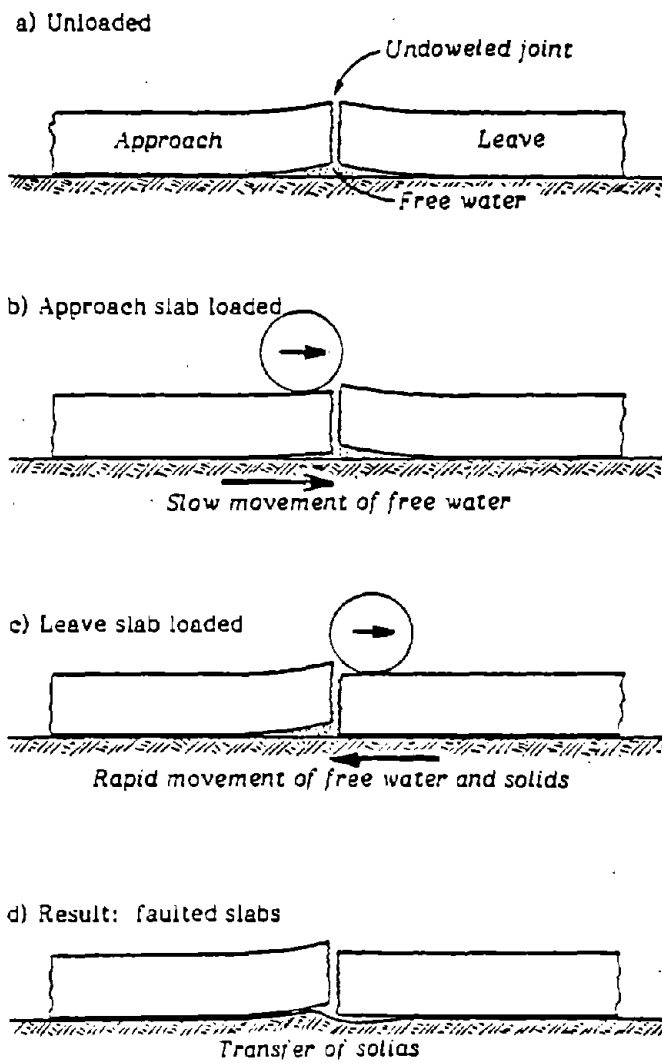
Joint Faulting Mechanism (Ref. 5)
